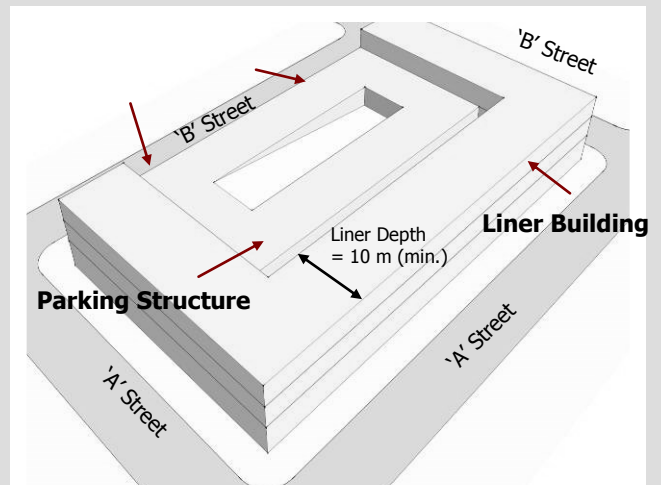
Facades that are articulated with architectural treatment to resemble authentic buildings, and/or more animated approaches are used to mask structured parking (applicable to 'B' Streets).
